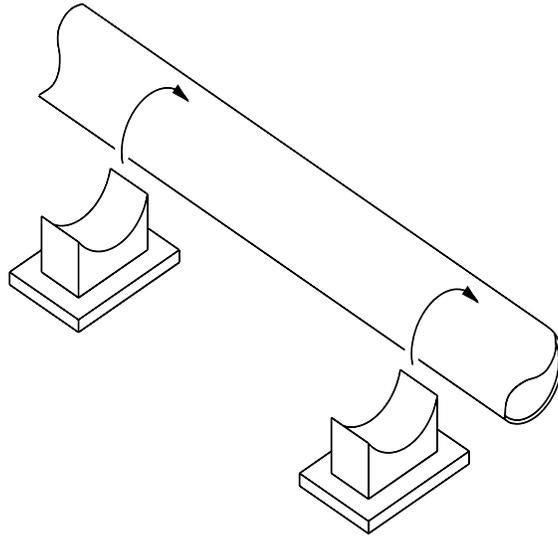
Pipeline Lifts Off Shallow Saddles
